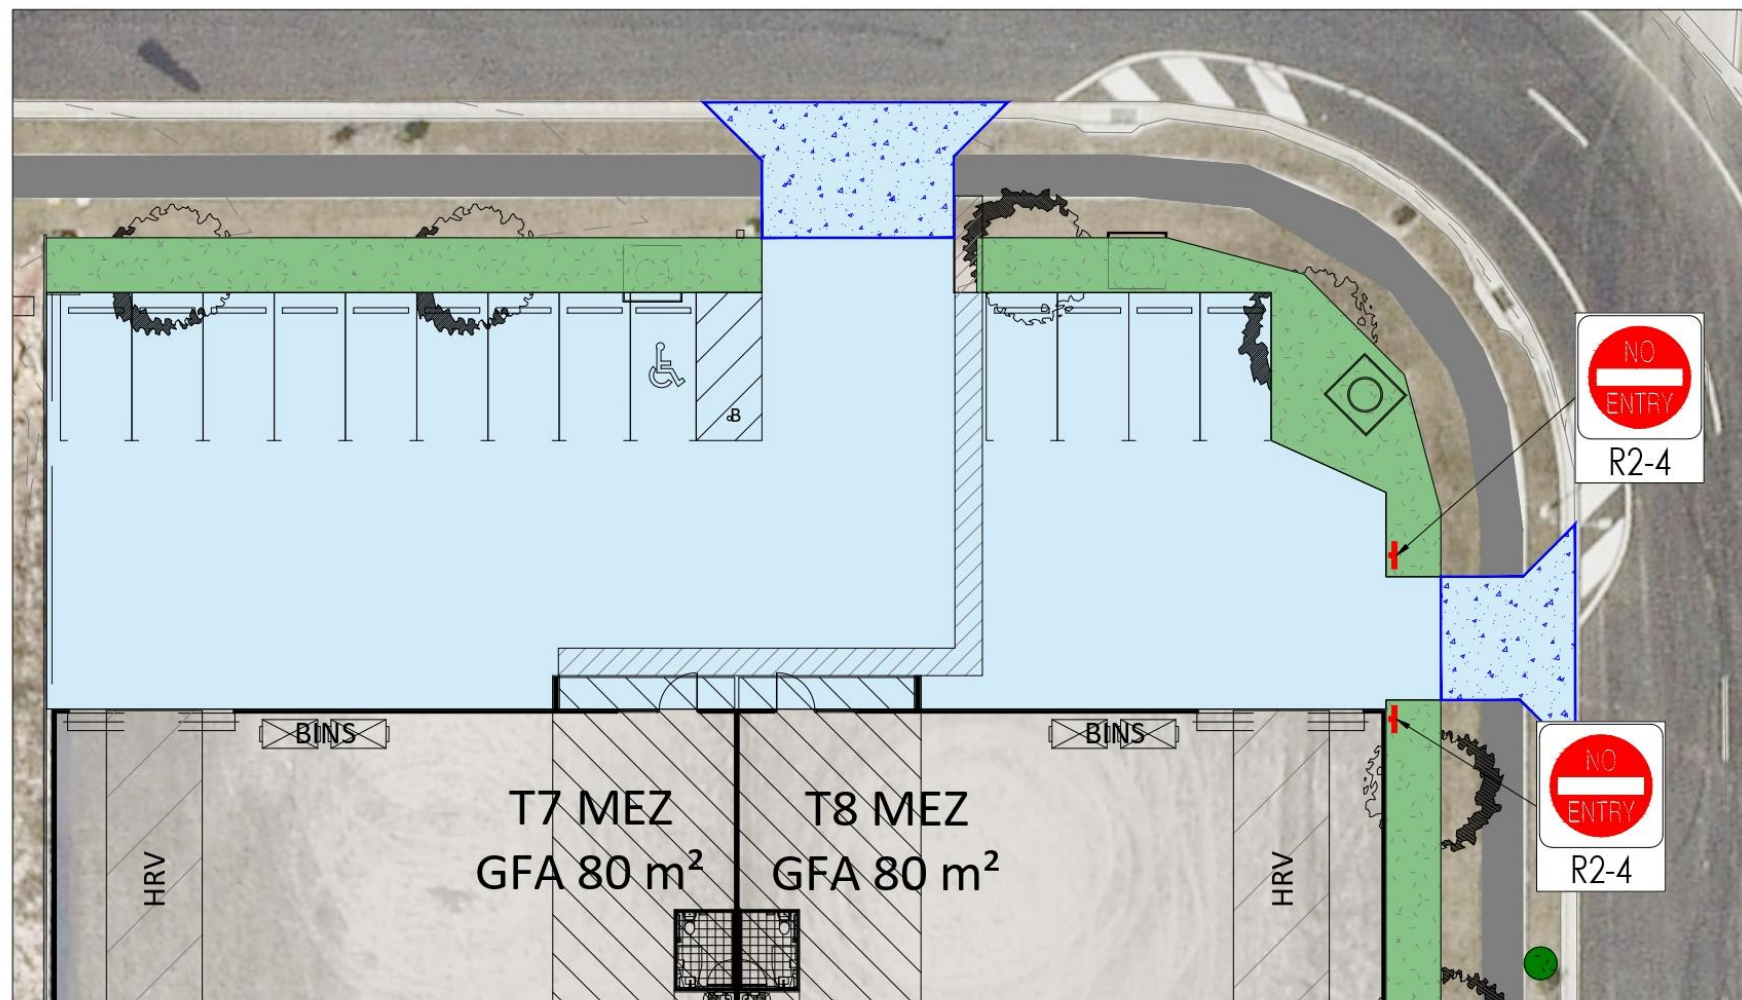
PROPOSED SIGNAGE PLAN
